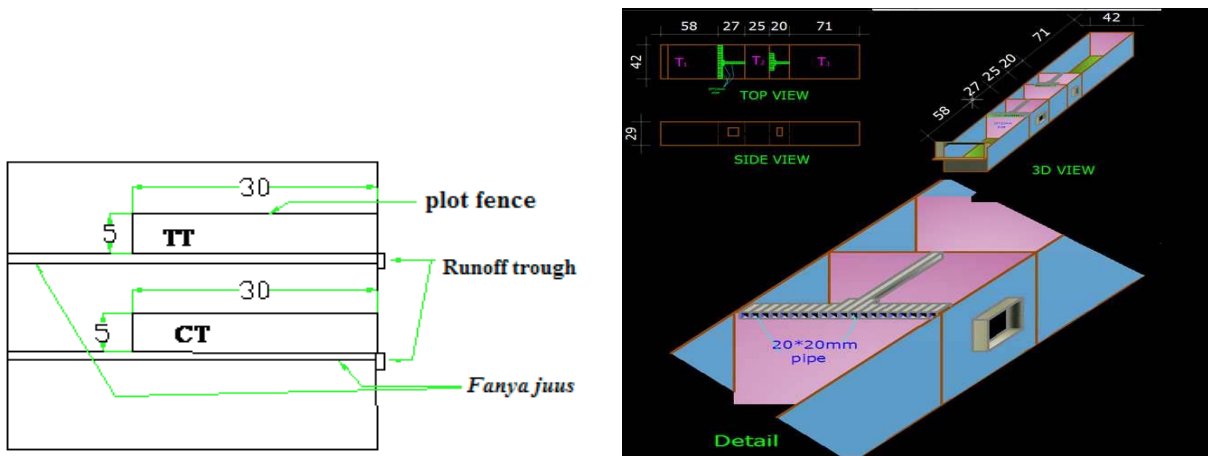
Layout of a single replication (2a) and design of runoff and sediment collection trench (2b) collection trench
